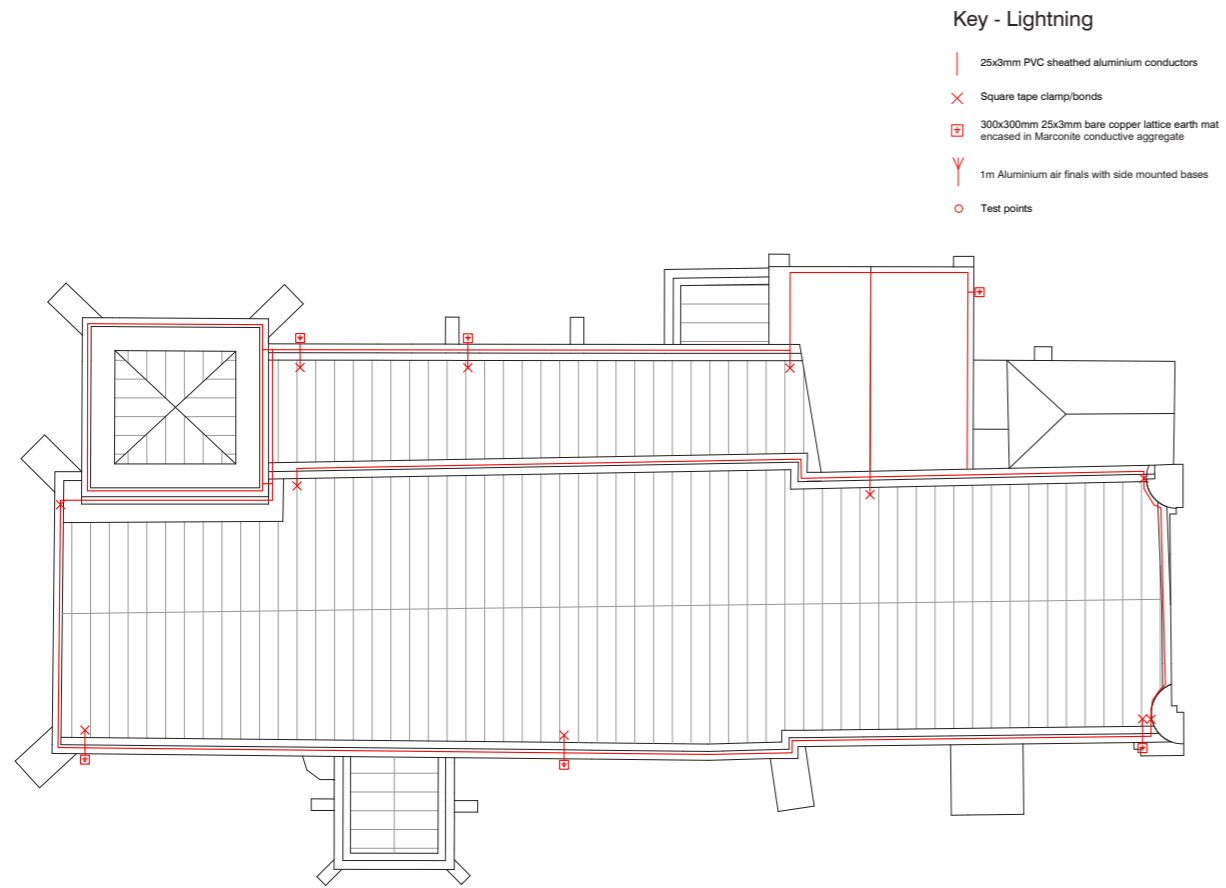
PROPOSED ROOF PLAN SHOWING LIGHTNING INSTALLATION
